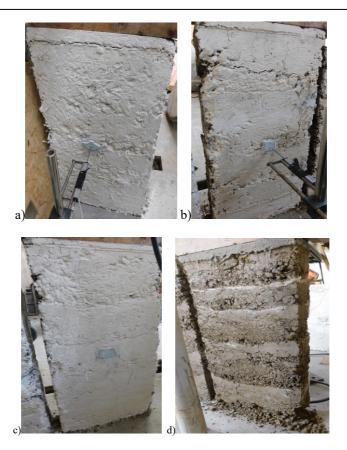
The rammed earth, wall element specimens: a) wheat straws disperse reinforcement (WS R) wall element;b) horizontal reinforcement of synthetic PP geogrid layer (PP-Gr R) wall element; c) Polypropylene fibres disperse reinforcement (PP R) wall element; d) horizontal reinforcement of thin wool layers (W R) wall element [49]
